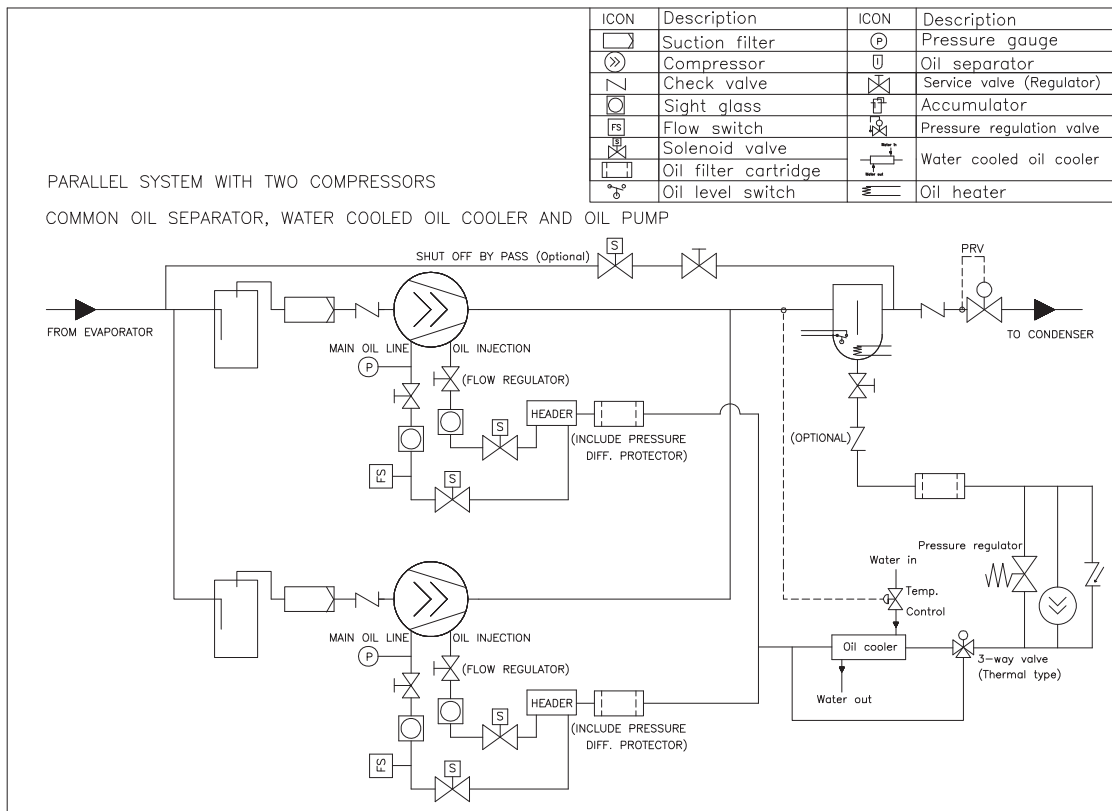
Parallel compounding with common oil separator, water cooled oil cooler and oil pump
